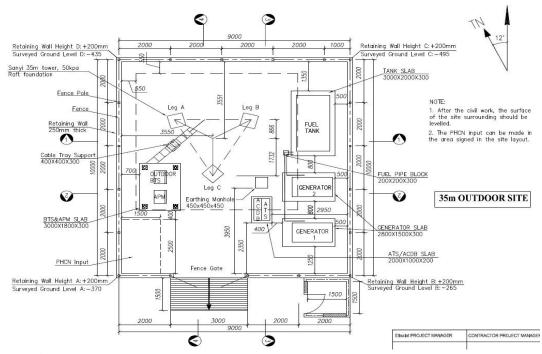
Layout of a typical telecommunication site (HIS Towers, 2020)
